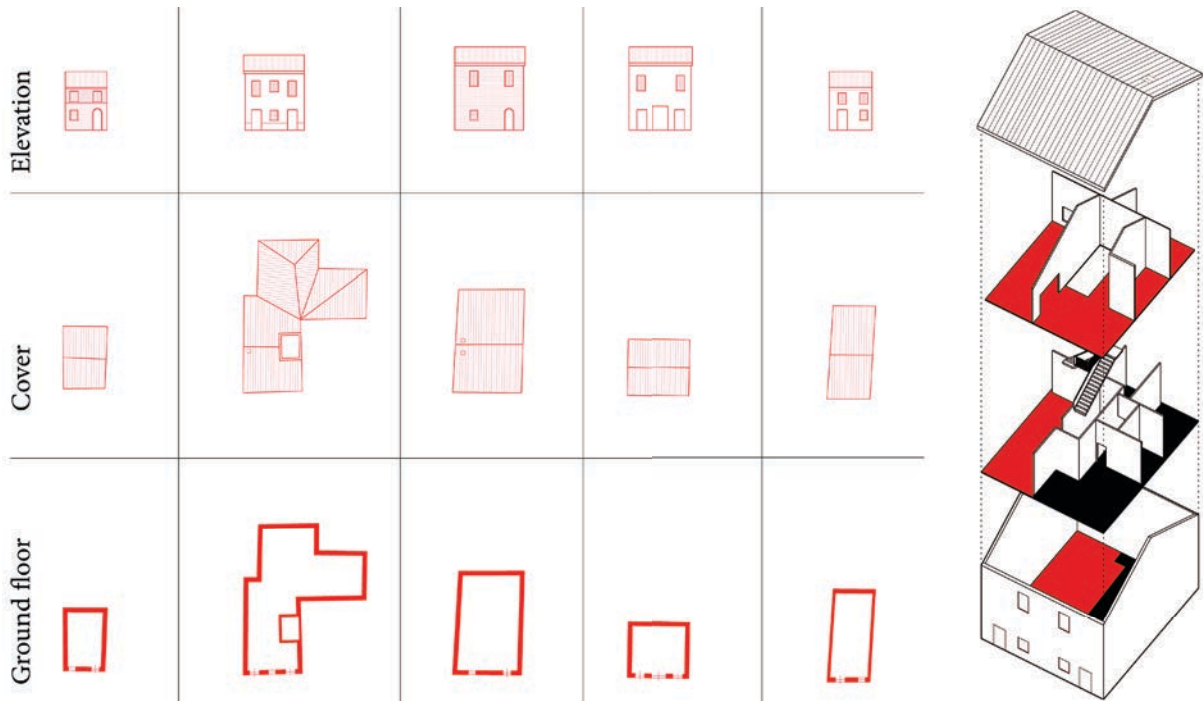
Typological abacus of some buildings overlooking Via Lavatoio, Rimini and an exploded axonometric composition of a typical building. The abacus includes ground floor plans, roof plans and elevations.
